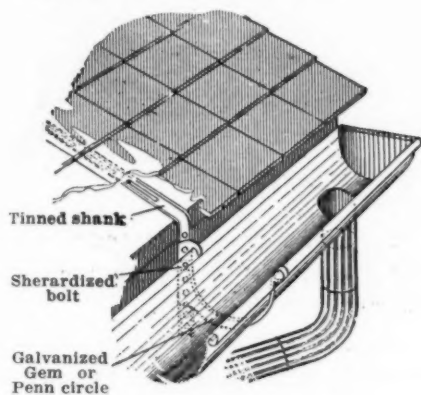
Use Only Galvanized Circles With Sherardized Bolts and Tinned Hangers. All Outlets, End Caps and Miters Must Be of Zinc.
